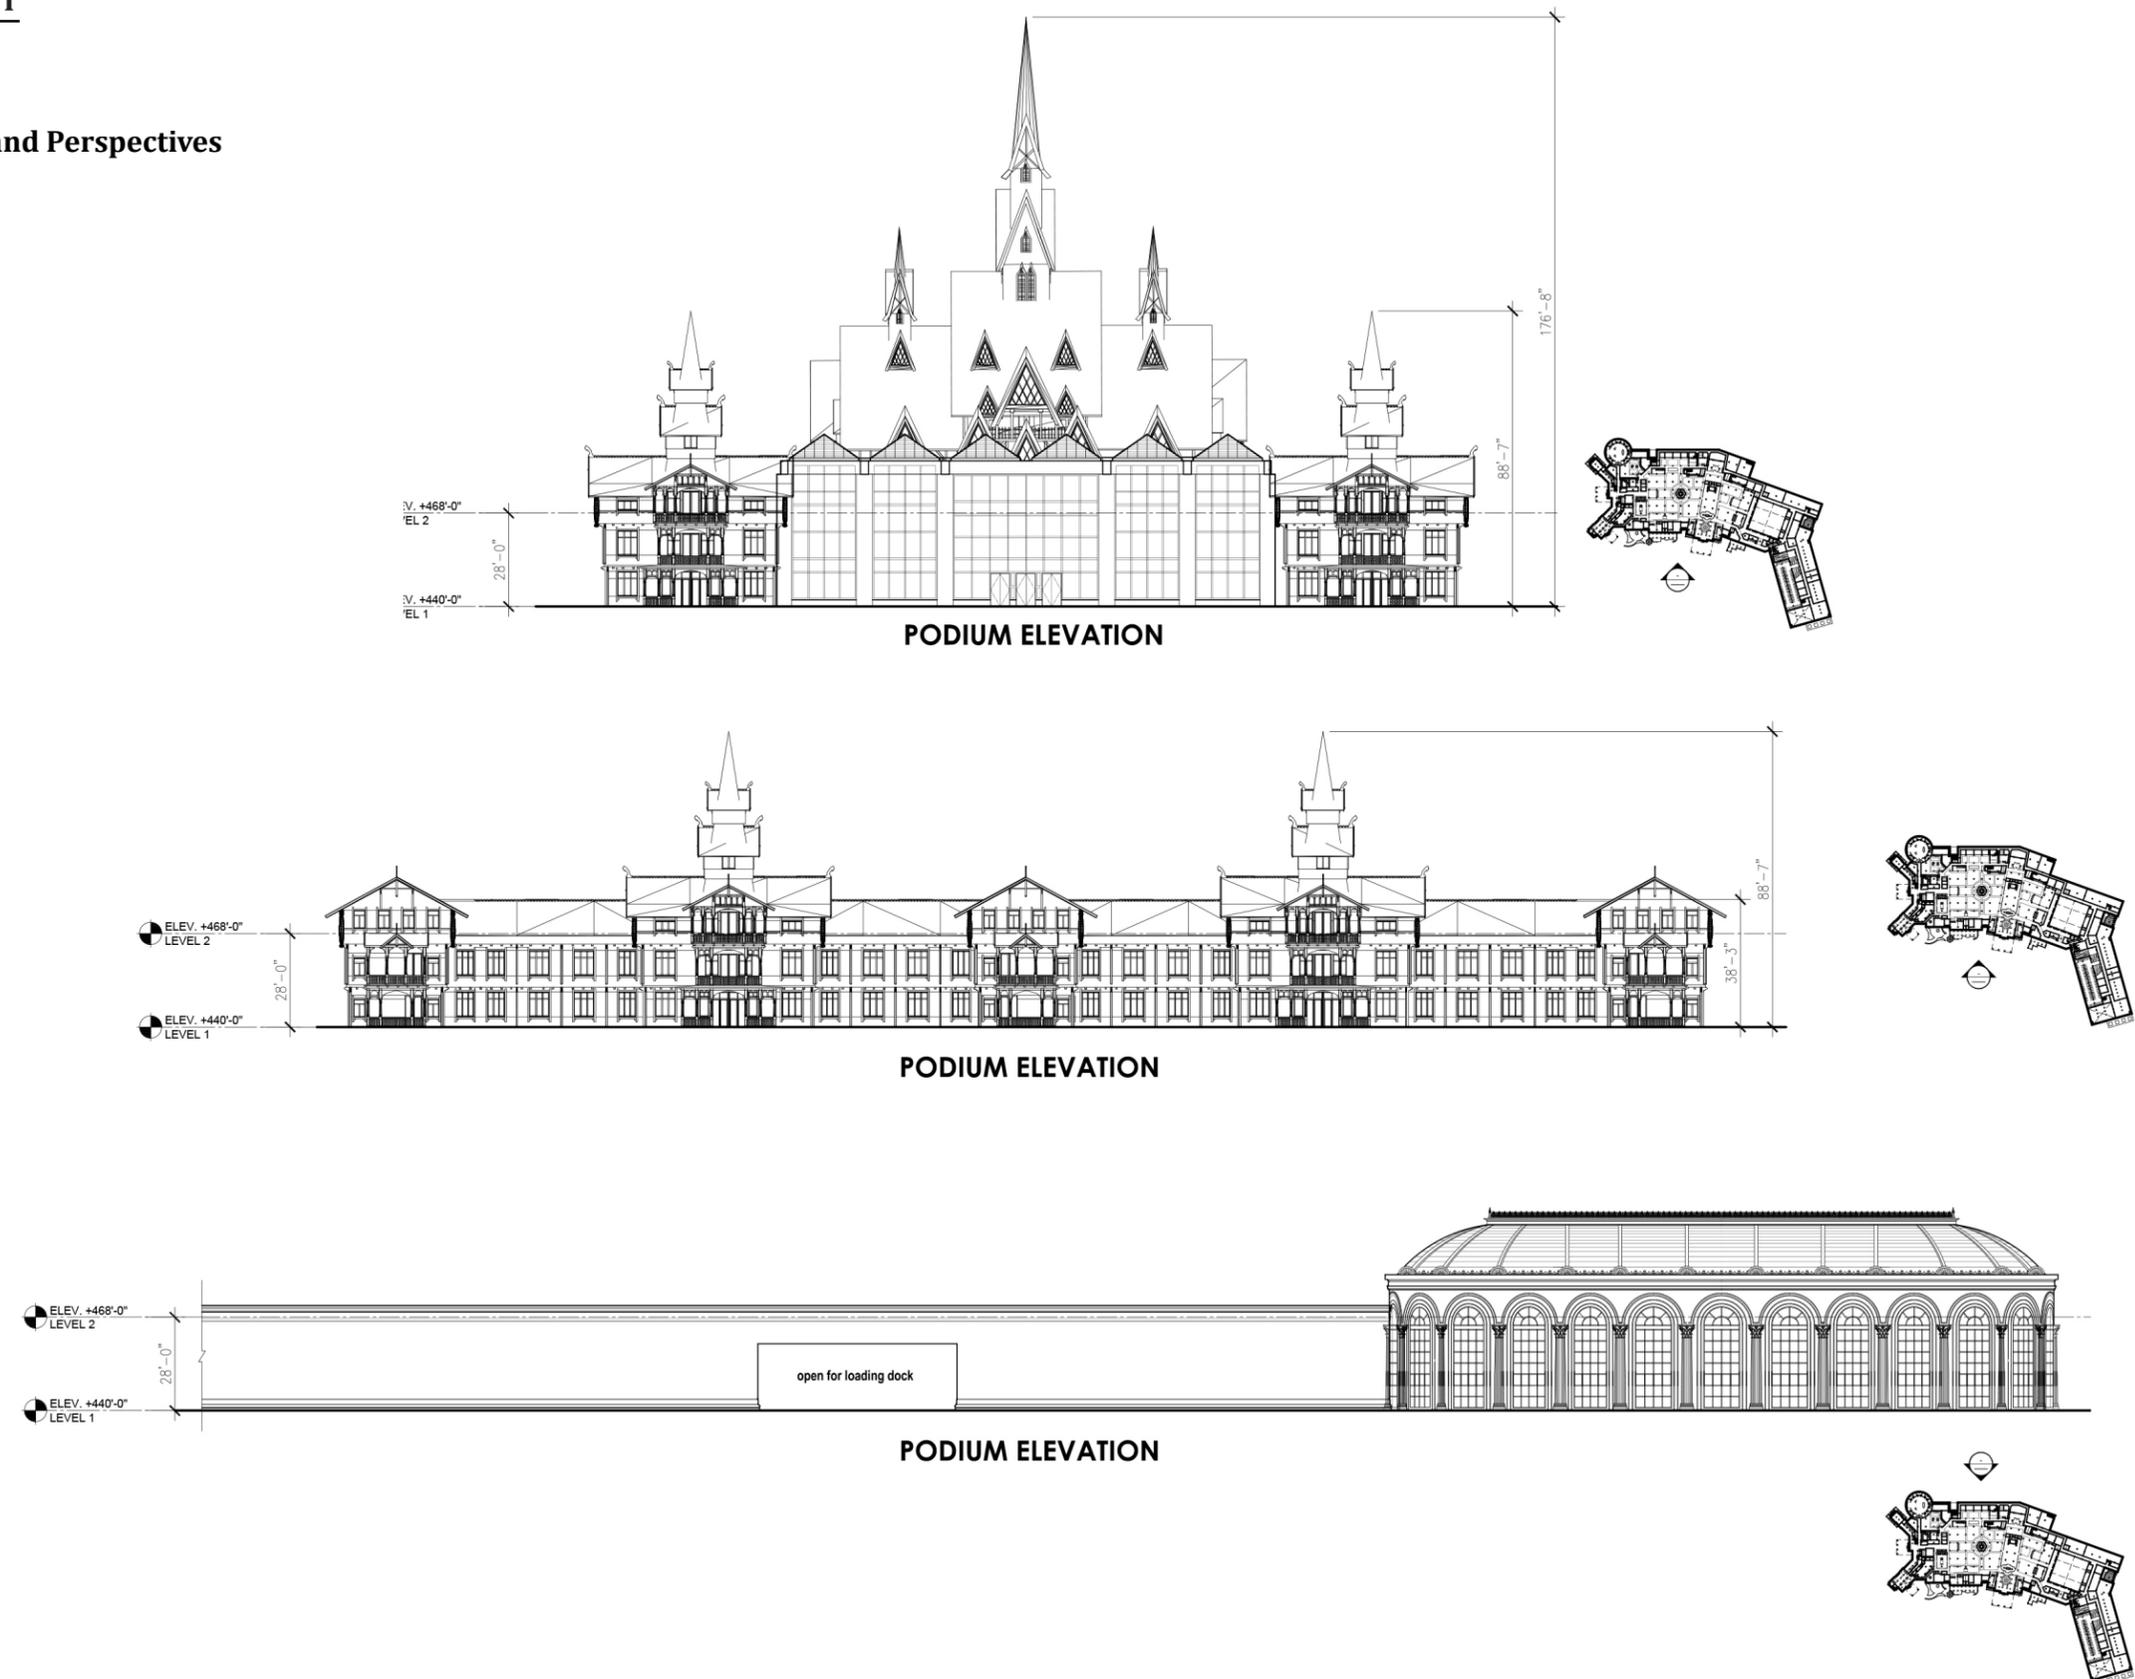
a.3-1 Building Elevations and Perspectives
